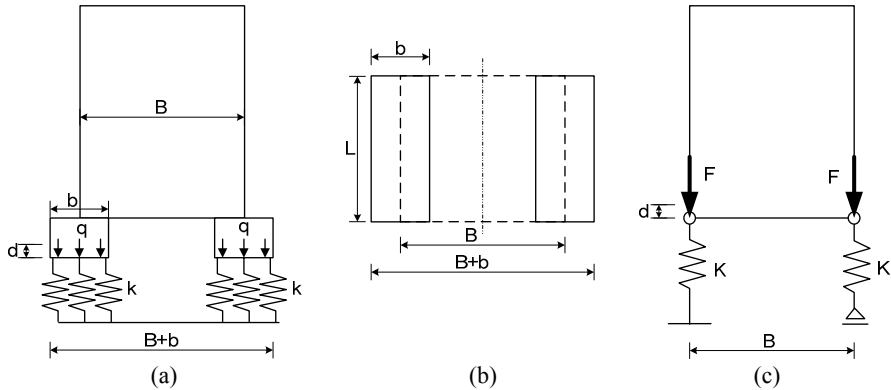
The simplified model: (a) structure and the soil; (b) plan view of foundations; (c) resultant foundation reactions.
